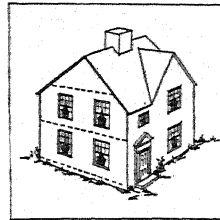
DESIGN IN WHICH RIDGE IS ON CENTRE. GABLE INTRODUCED FOR HEAD ROOM WHERE RAFTERS START BELOW SECOND STOREY CEILING
